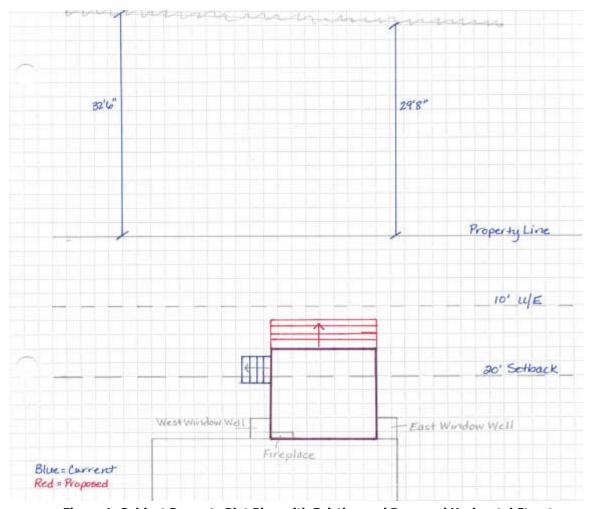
Subject Property Plot Plan with Existing and Proposed Horizontal Structure.
